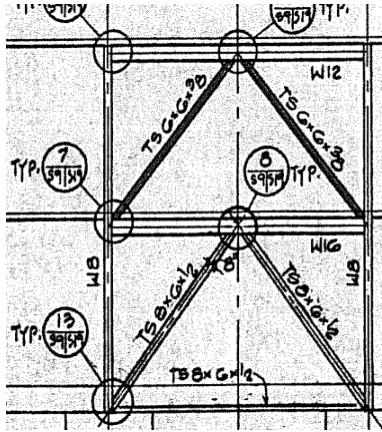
Frame Elevation (88CA3A--1-CD-2)
